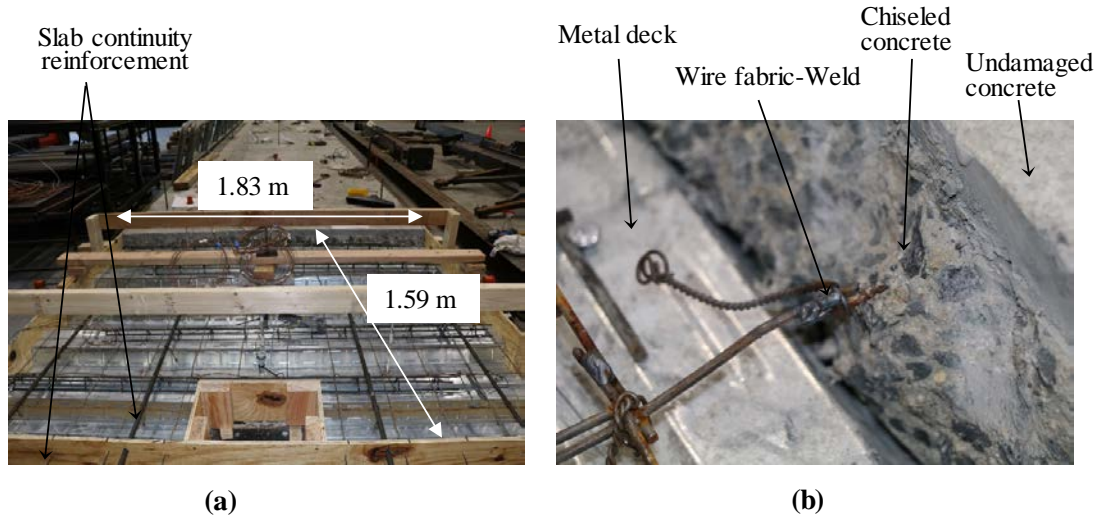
Top view of damaged concrete slab of Specimen CB-SP-SC.
